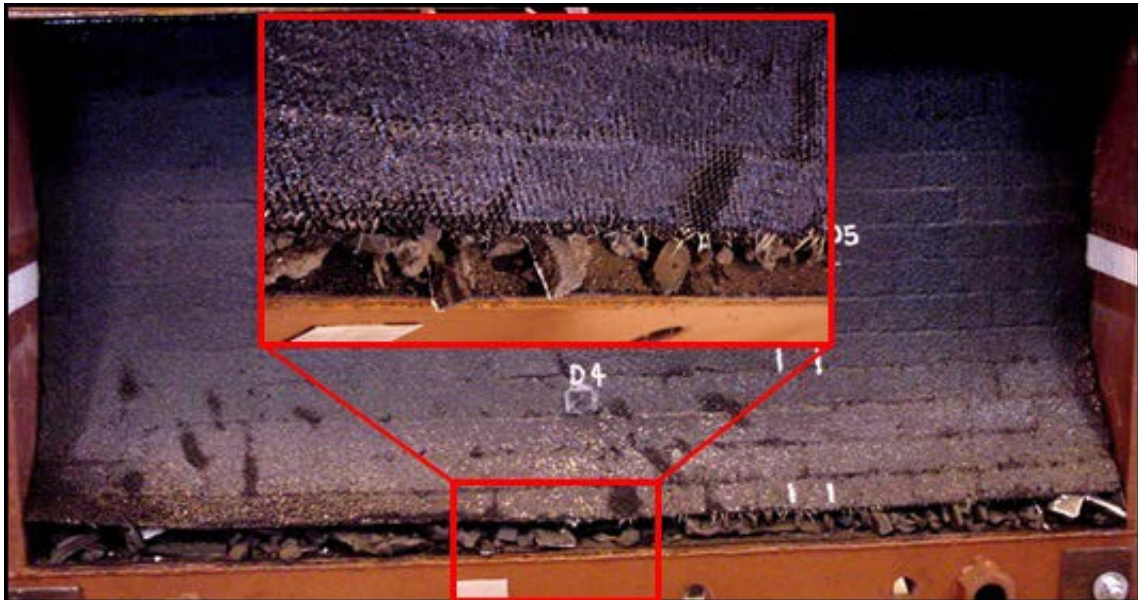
Failure at bottom support of elastomer and fabric reinforcement.
